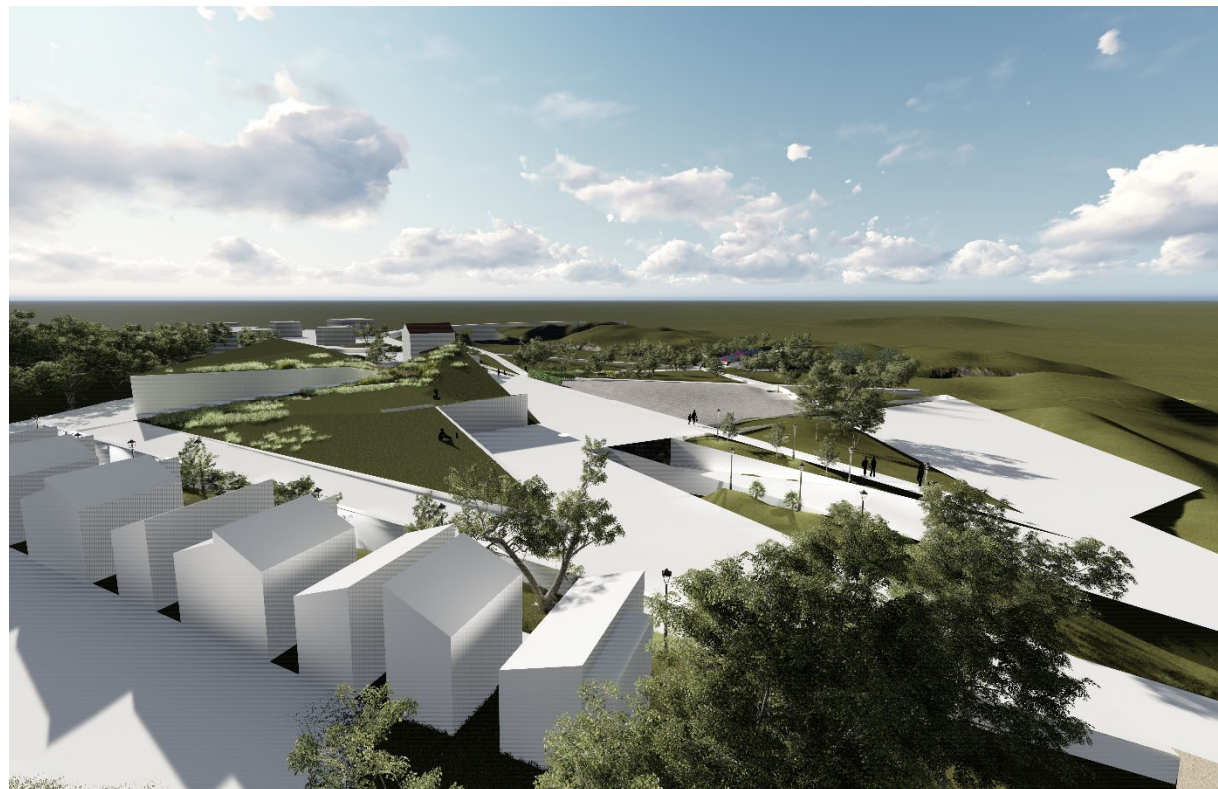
Perspective from the bird's eye view of the green roof building and main pavilions
